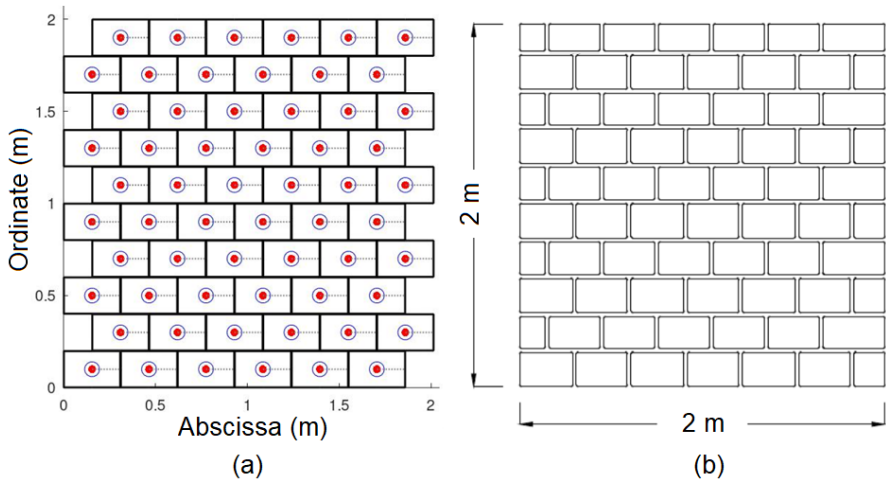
Masonry: (a) Masonry model of the present work. (b) Masonry wall studied in [46].
